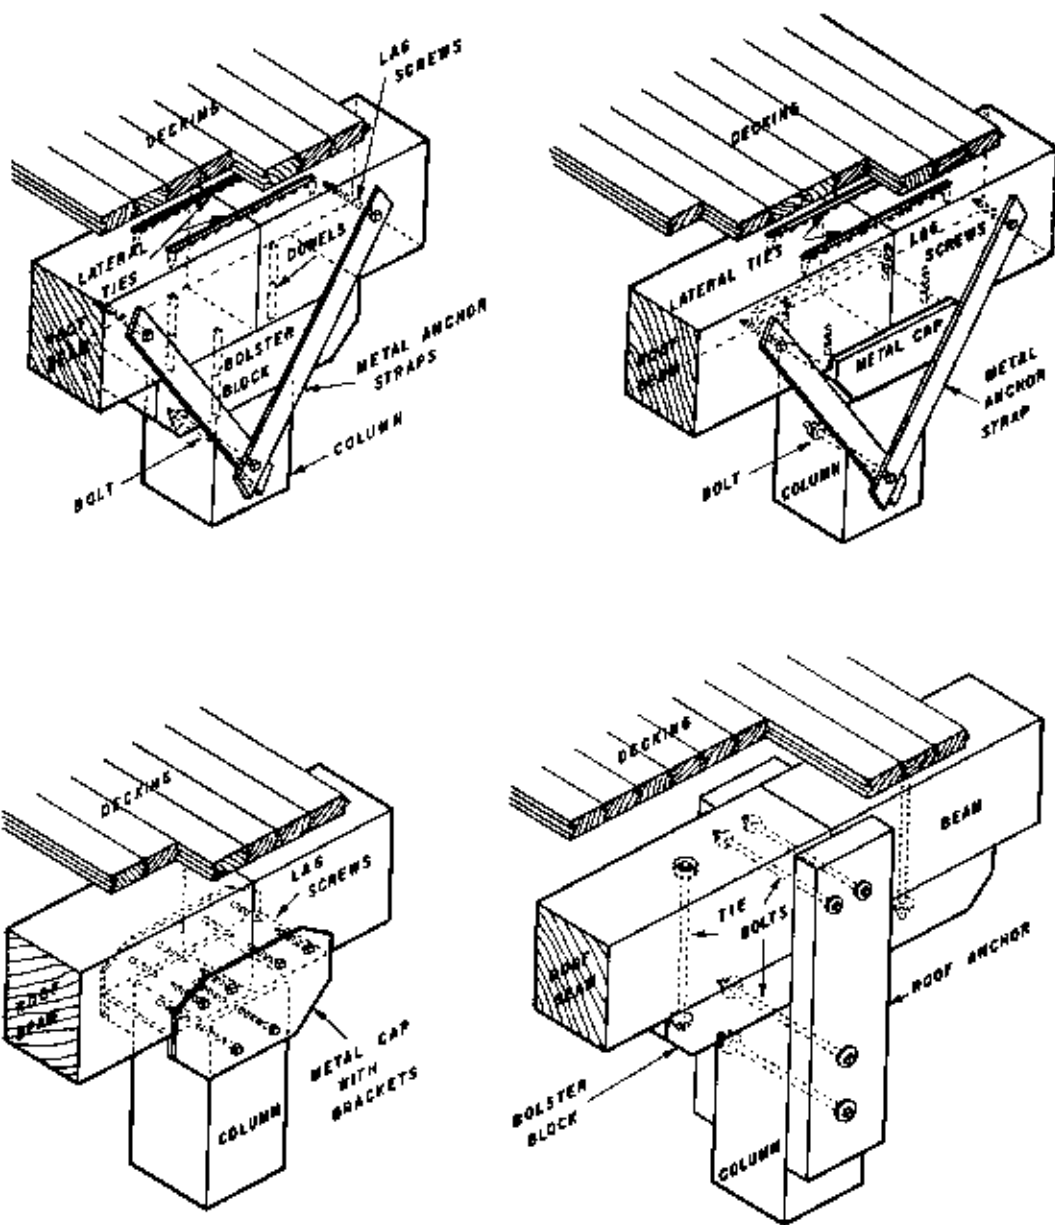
Typical roof beam and column connection details. (Courtesy of American Forest and Paper Association)
